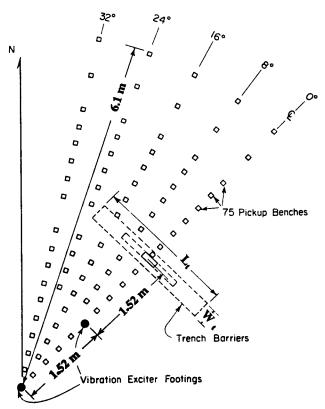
Plan view of field-site layout for passive isolation with a trench (10).
